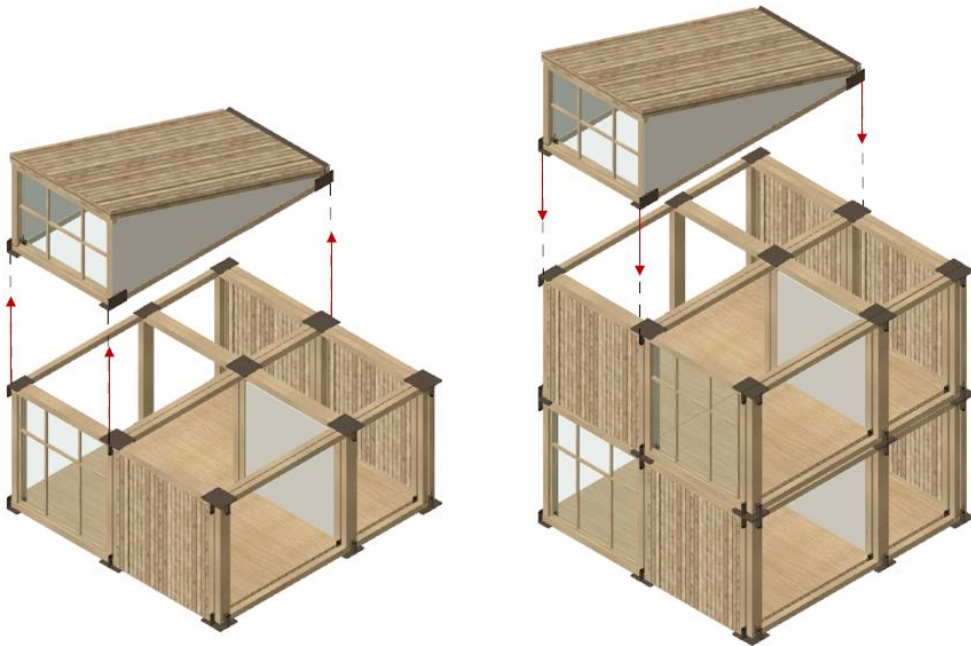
Incremental Expansion: Detachable Roof and Vertical Module Addition (by the author)
